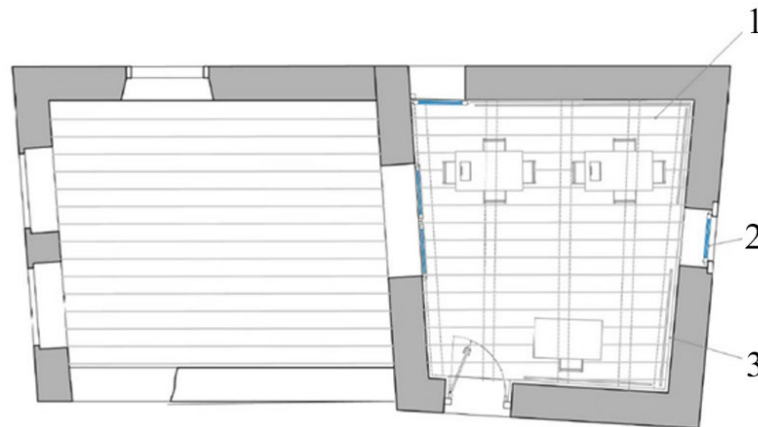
Casa Dell'affresco Detail of the works planned on the first floor - House of Arches, (FoRTI, 2022)
